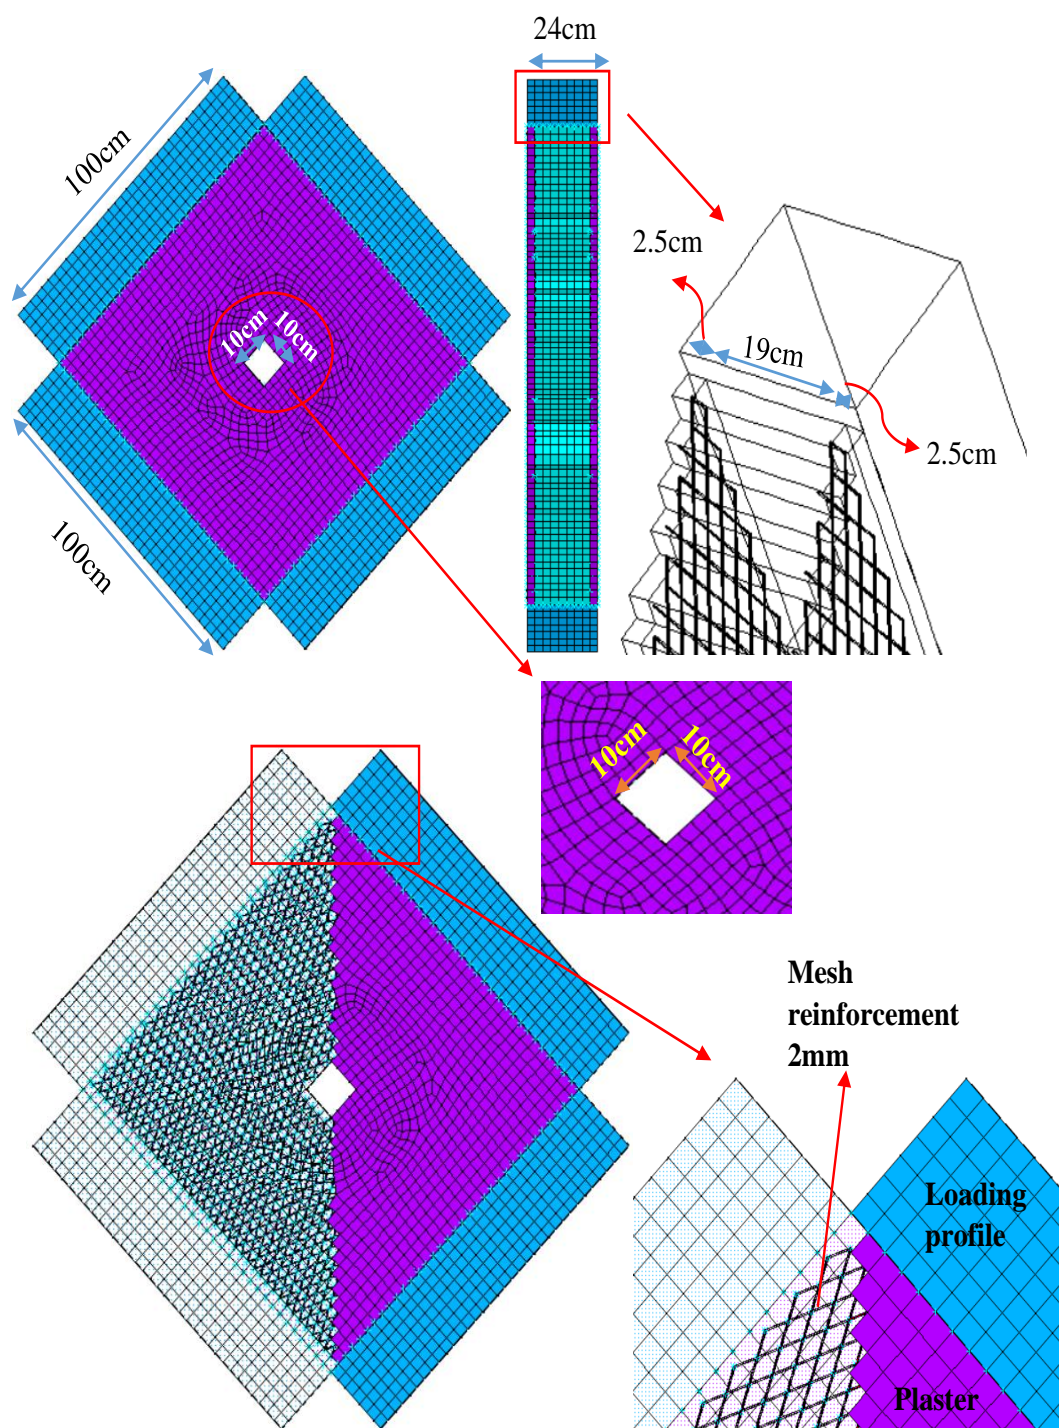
10% opening ratio of the masonry wall model-2.0mm mesh reinforcement
